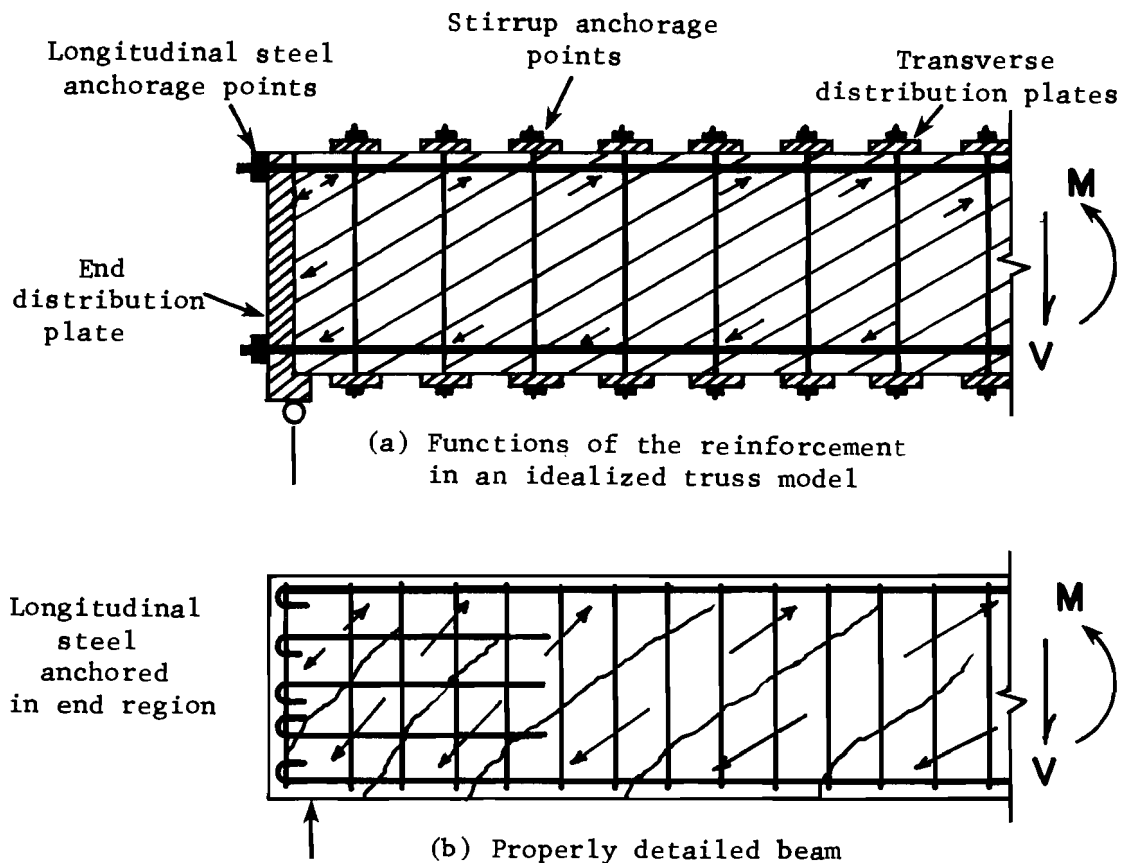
Detailing considerations for a beam subjected to shear [from Ref. 56]
